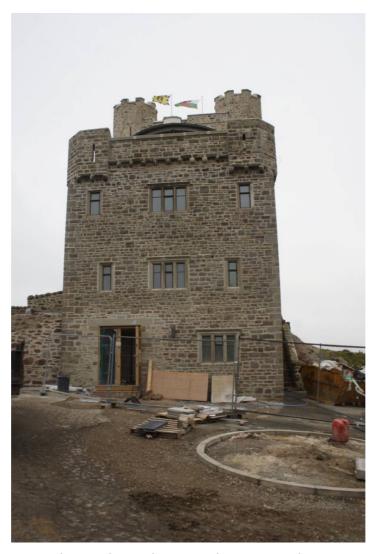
The northern elevation showing Northern Extension with turrets of D-Shaped Tower just visible above (September 2011)
